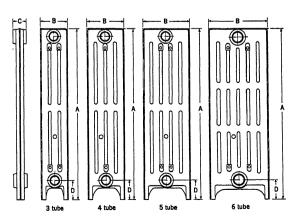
Types and Dimensions of Small-Tube Cast-Iron Radiators
